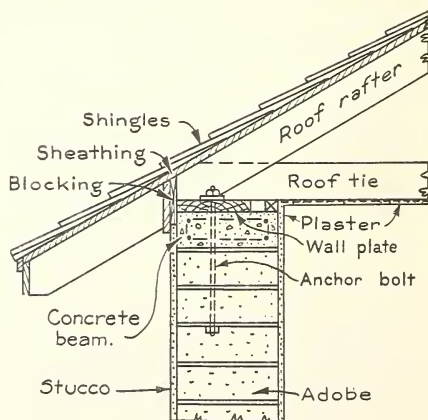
Anchoring a sloped roof to an earth-block wall.
